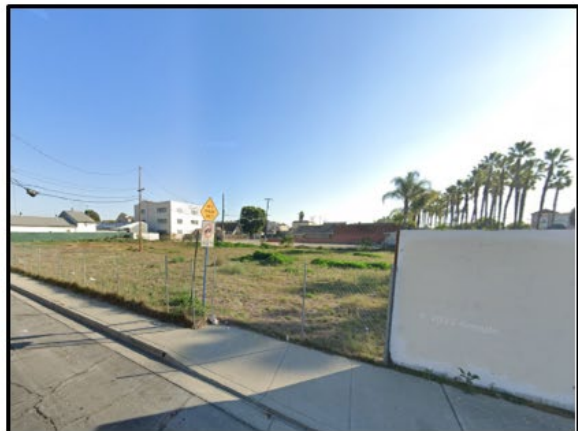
View looking at the northern portion of the project site along 176th Street.
